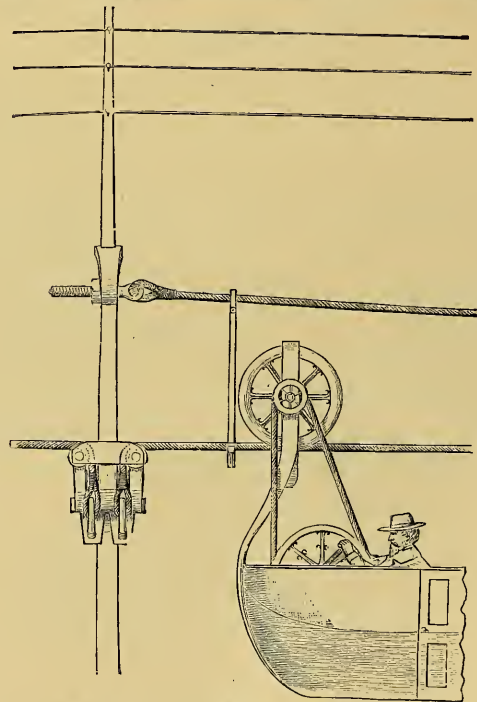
WATER HYDE'S ELEVATED RAILWAY.
